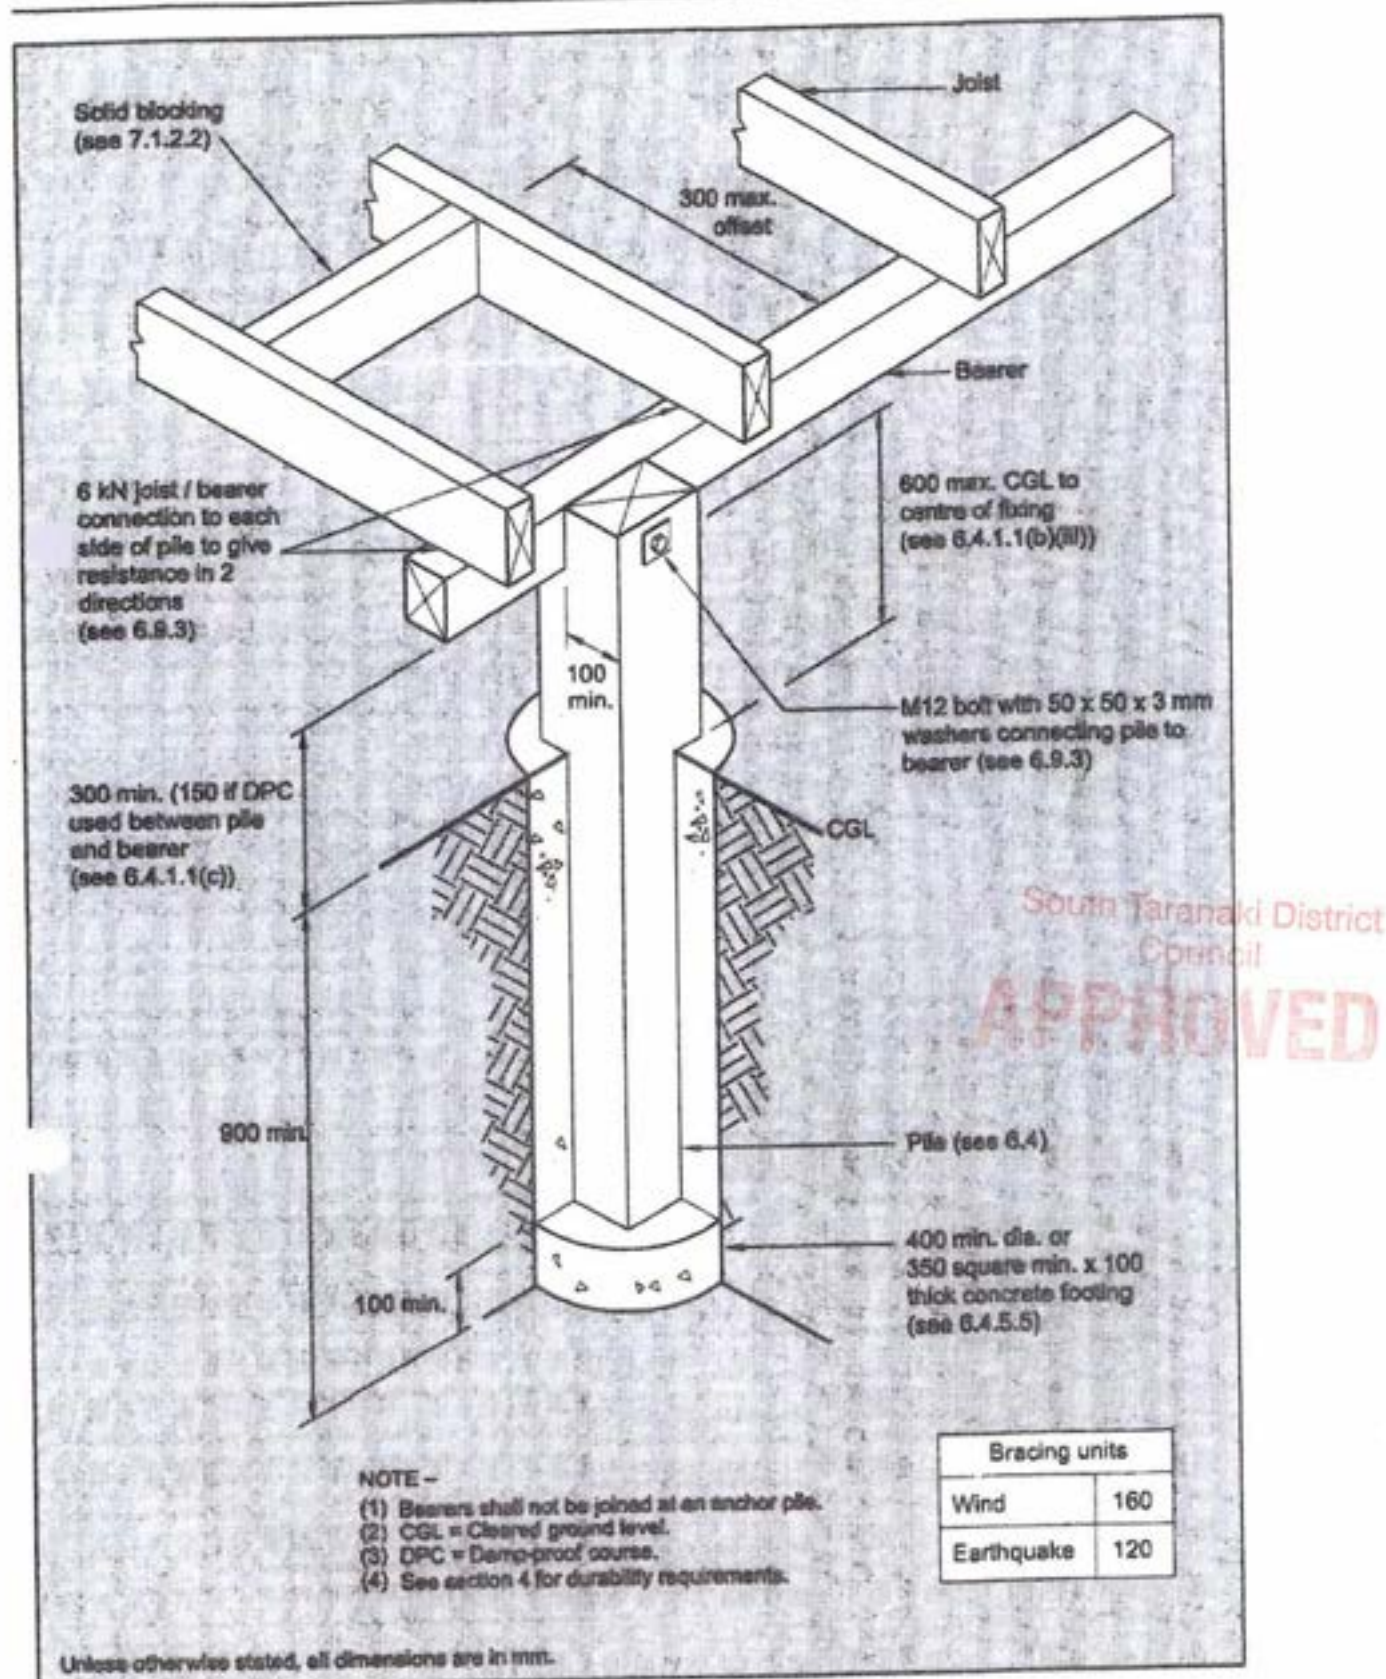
Anchor pile directly connected to bearer only (see 6.9)
